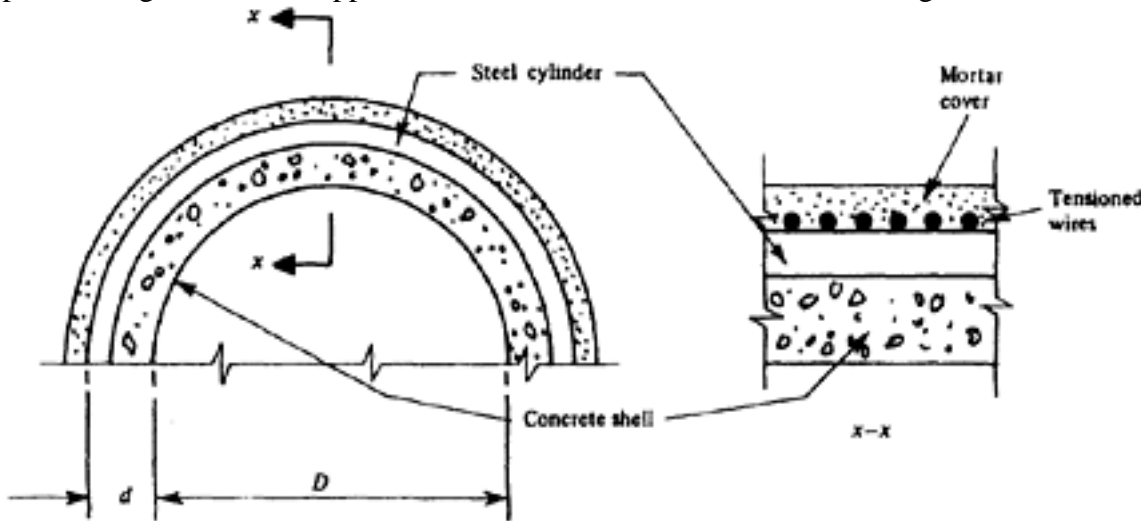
Prestressed concrete pipe cylinder type (BS 46 25)
